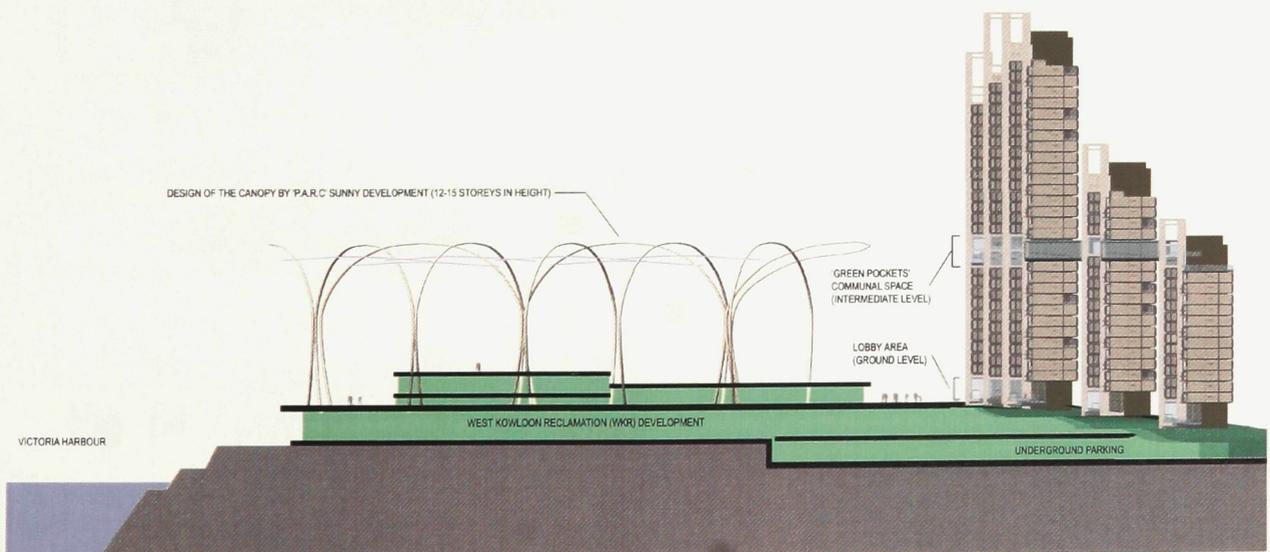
Section of the proposed residential complex with the adjacent WKR development.
